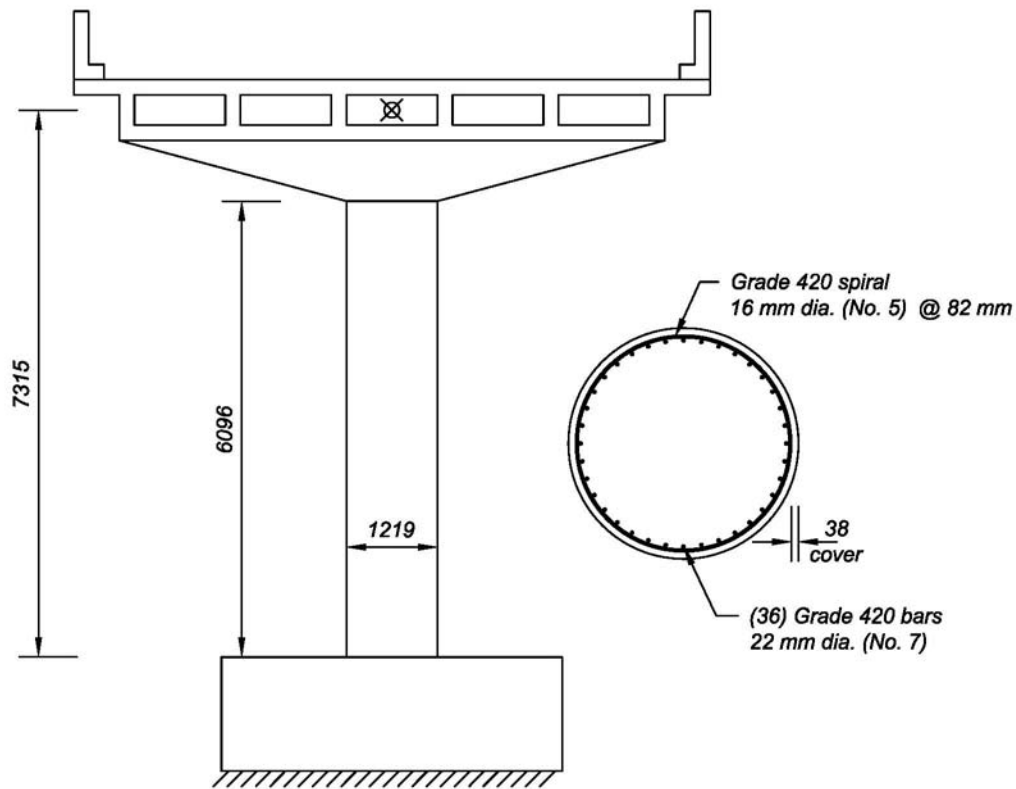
Elevation and cross section of the prototype R/C bridge bent (dimensions in mm).
